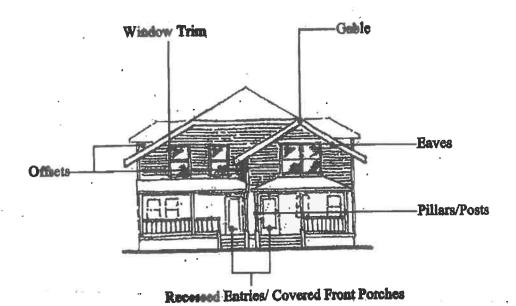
C(1) - Building Form (Multi-family Housing Example)
